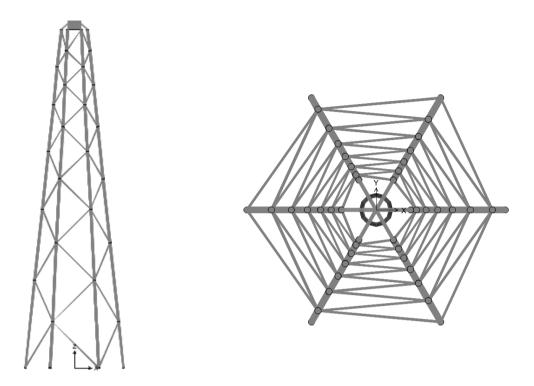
Lattice structure of onshore wind turbine tower: side view (left), top plan view (right)
